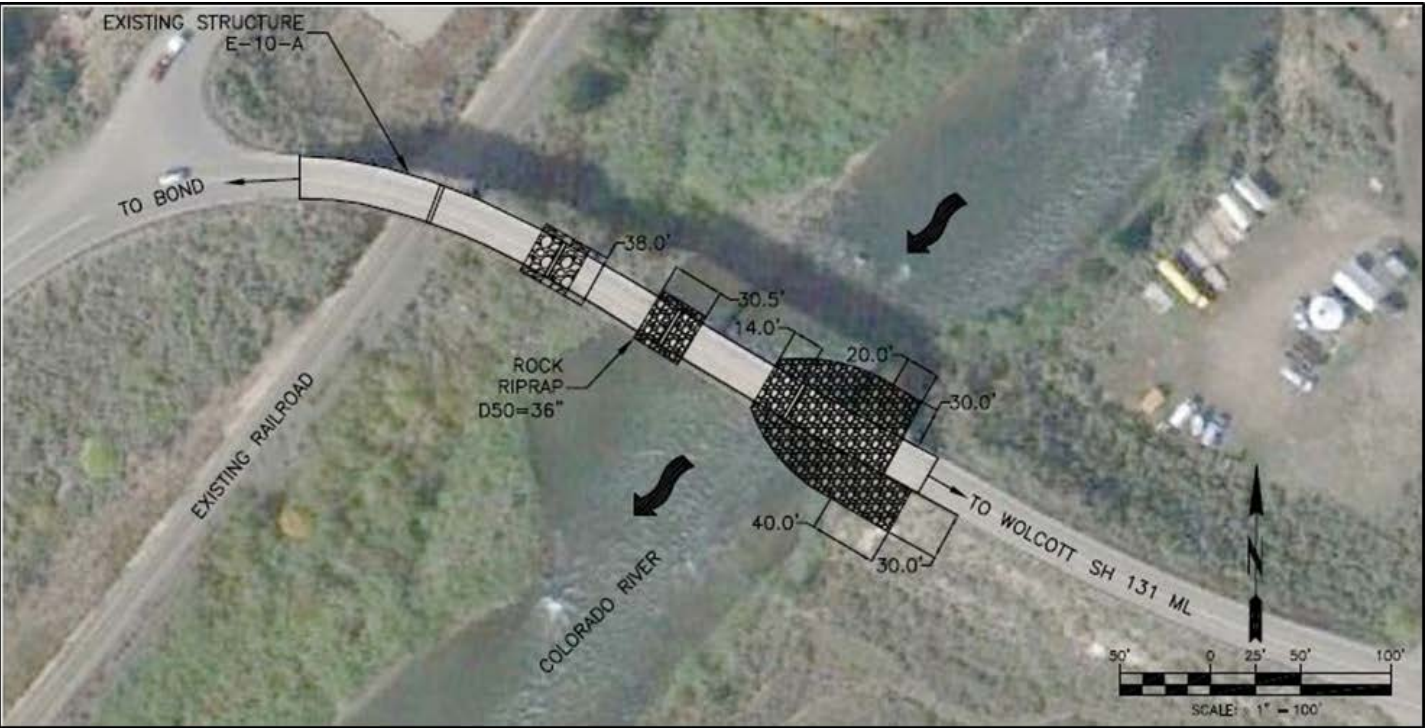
Plan view of Bridge E-10-A with recommended hydraulic scour countermeasure locations
